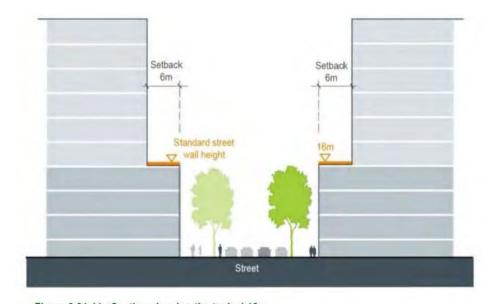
Section showing the typical 16m street wall height and typical 6m upper level setback
